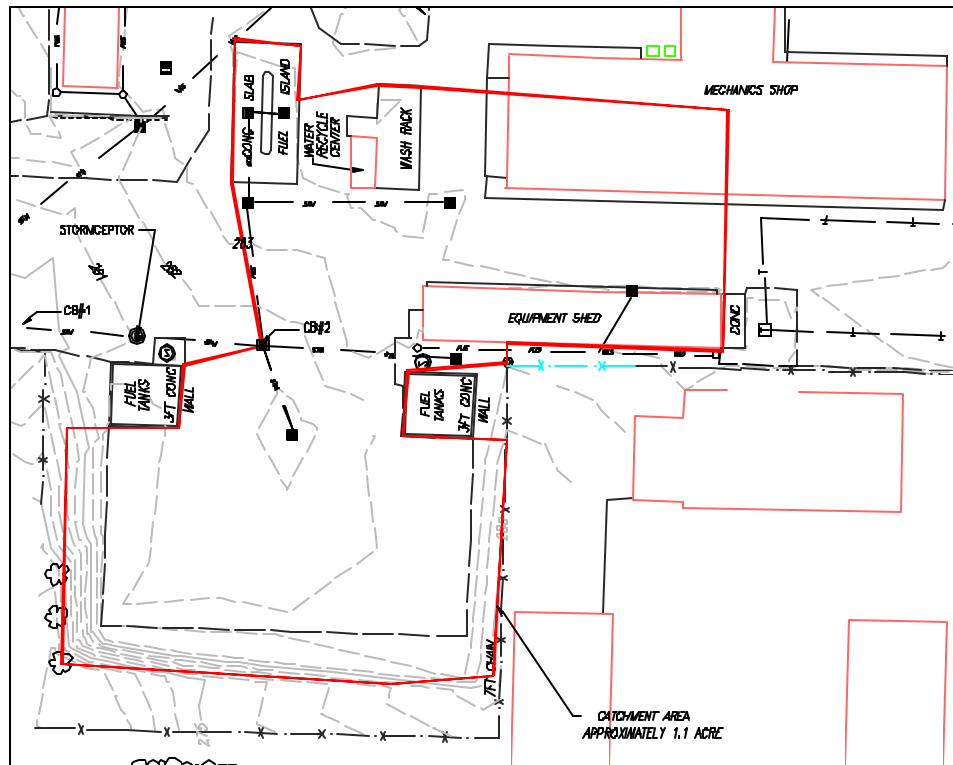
Layout of Stormceptor[®] study site at 78th Street Maintenance and Operations facility.
